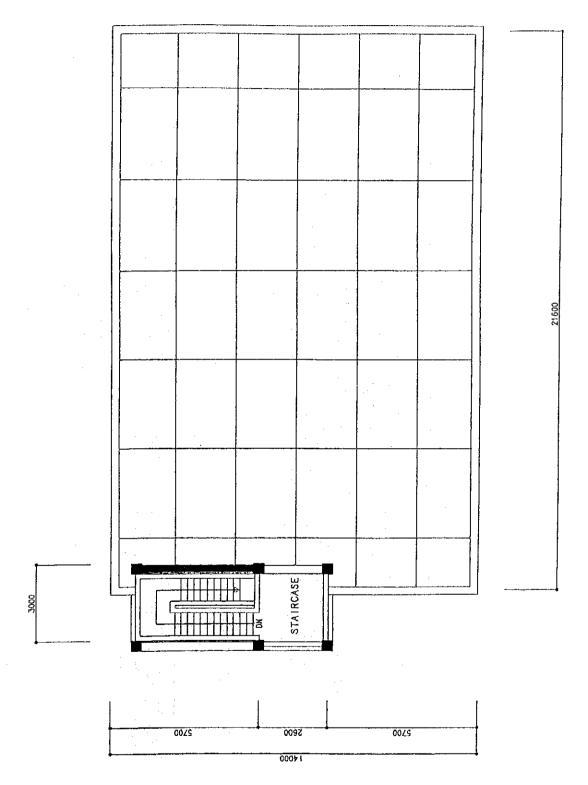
(3) ROOF FLOOR PLAN (3-CLASROOM TYPE)
